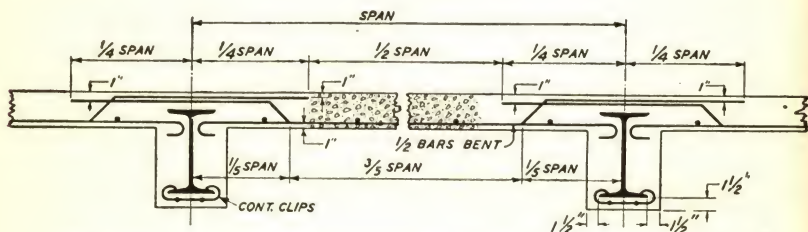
B. Detail for Reinforced Concrete Slab and Fire Protection for I-Beams
